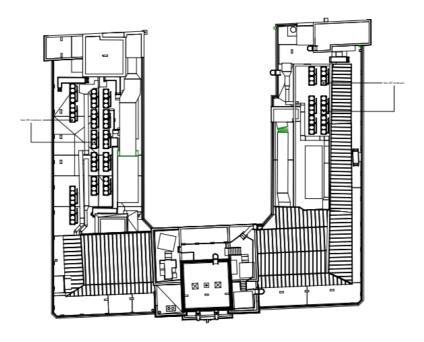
Proposed Roof Plan Showing Plant Machinery
